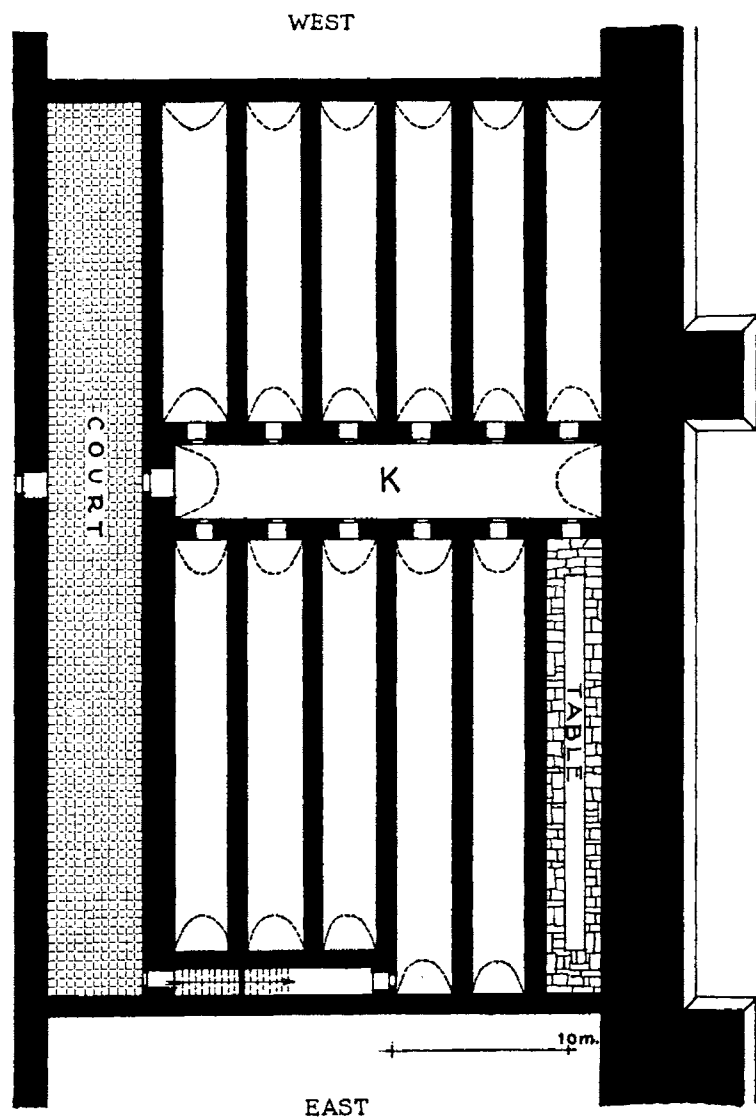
GROUND PLAN OF STOREHOUSE *K
